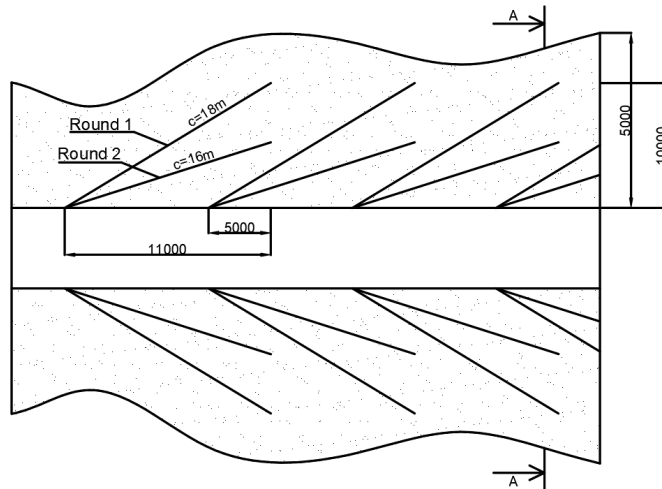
Cross section of the grouting procedure in the main tunnels (parallel to the tunnel direction)
